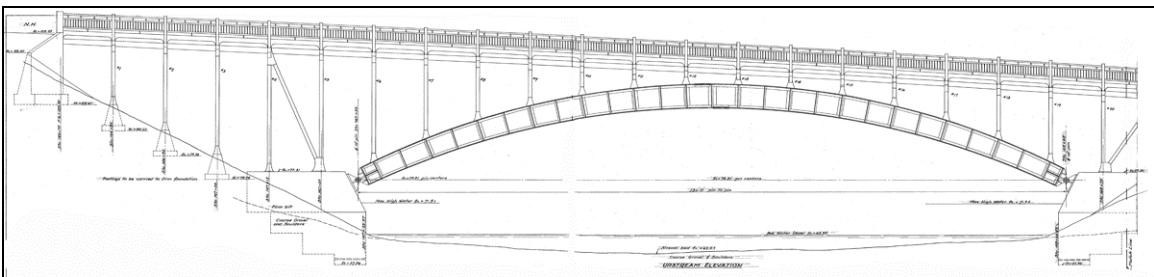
Beechers Falls Bridge, elevation drawing from original bridge plans (NHDOT 1930).
